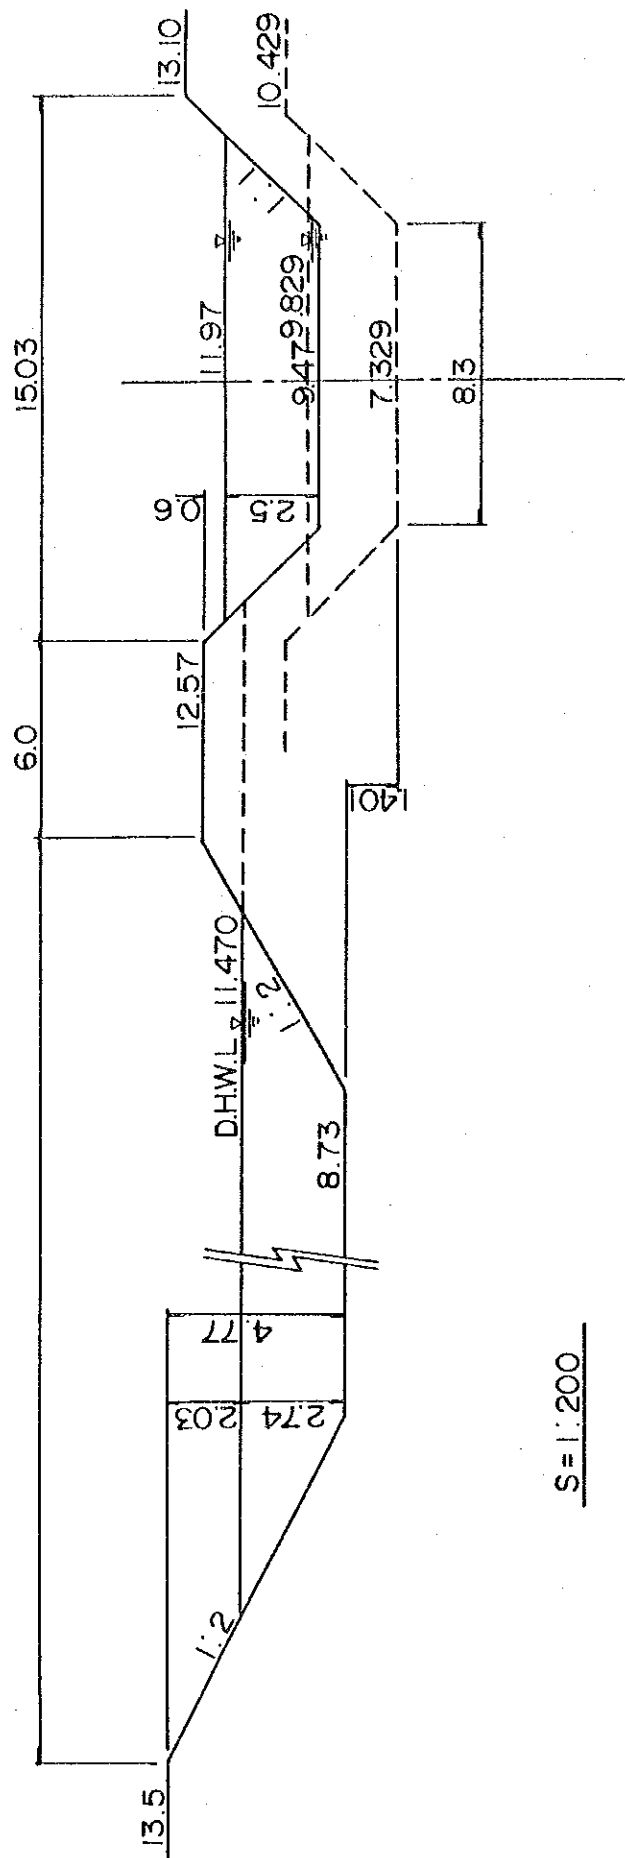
TYPICAL CROSS SECTION OF PROPOSED RETENTION POND C
